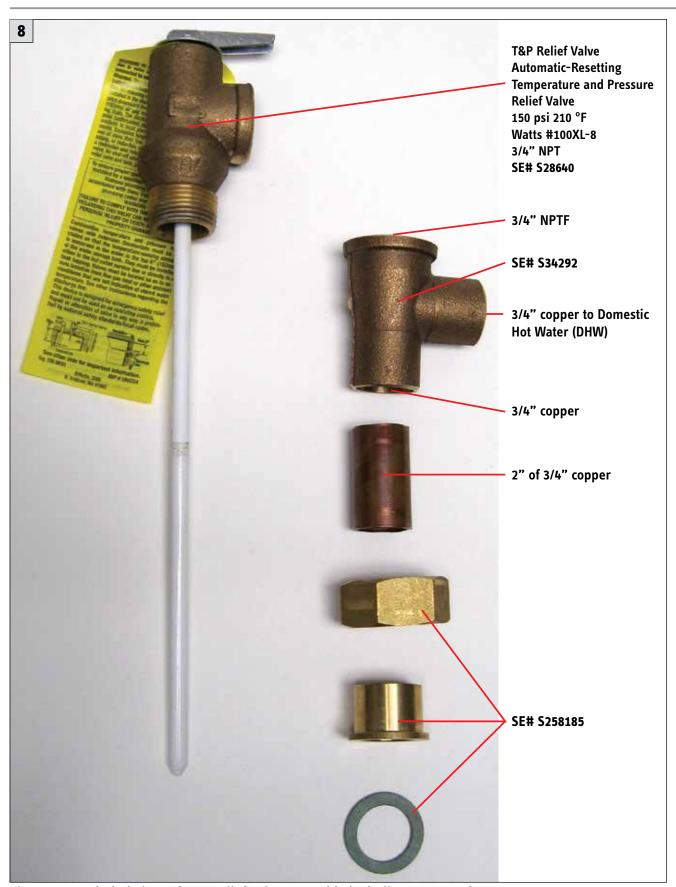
Exploded view of T&P relief valve assembly including part numbers
